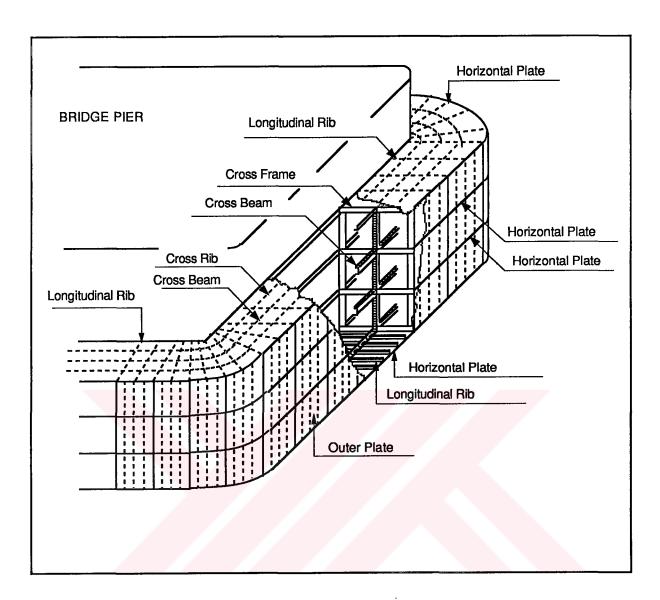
FRAMED STEEL FENDER SYSTEM USED FOR PROTECTION OF THE BISAN-SETO BRIDGES, JAPAN
